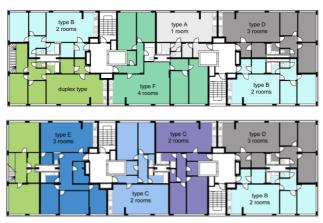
Example of plan view of building IX with new typologies (even / uneven floor)
